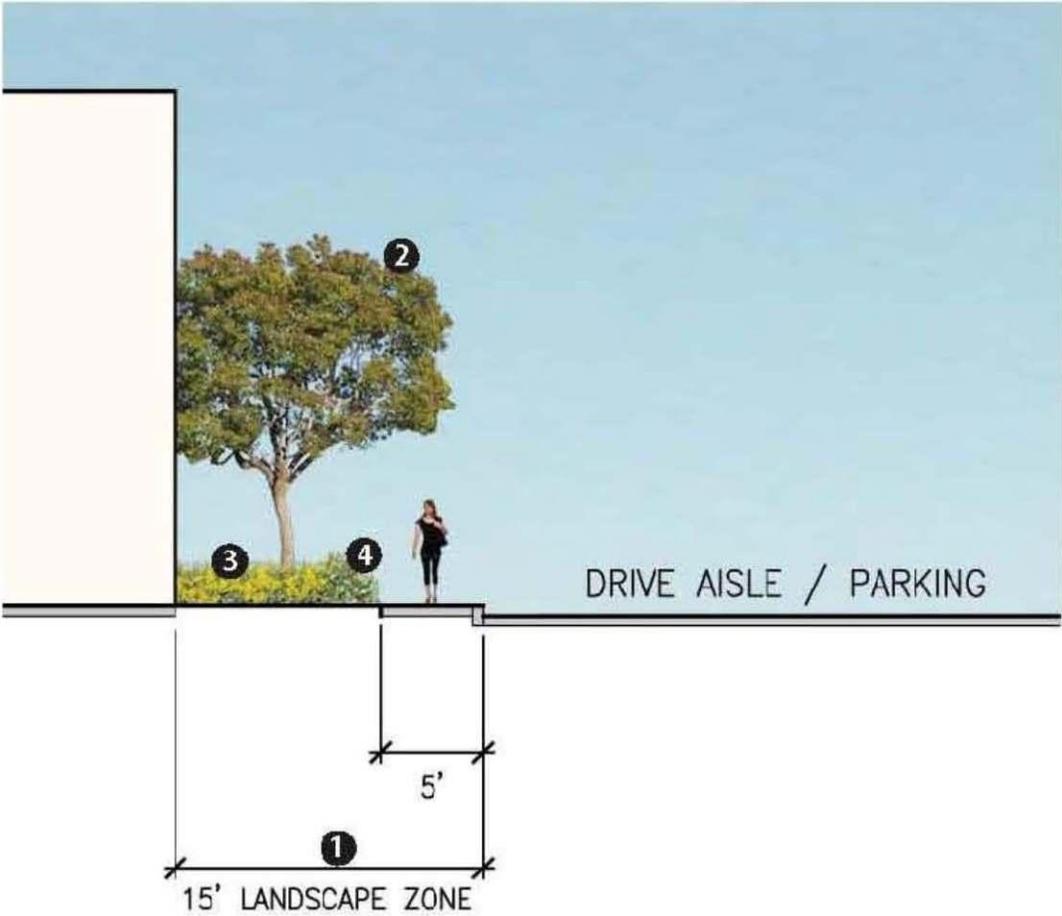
Retail Edge Condition at Parking Garage
